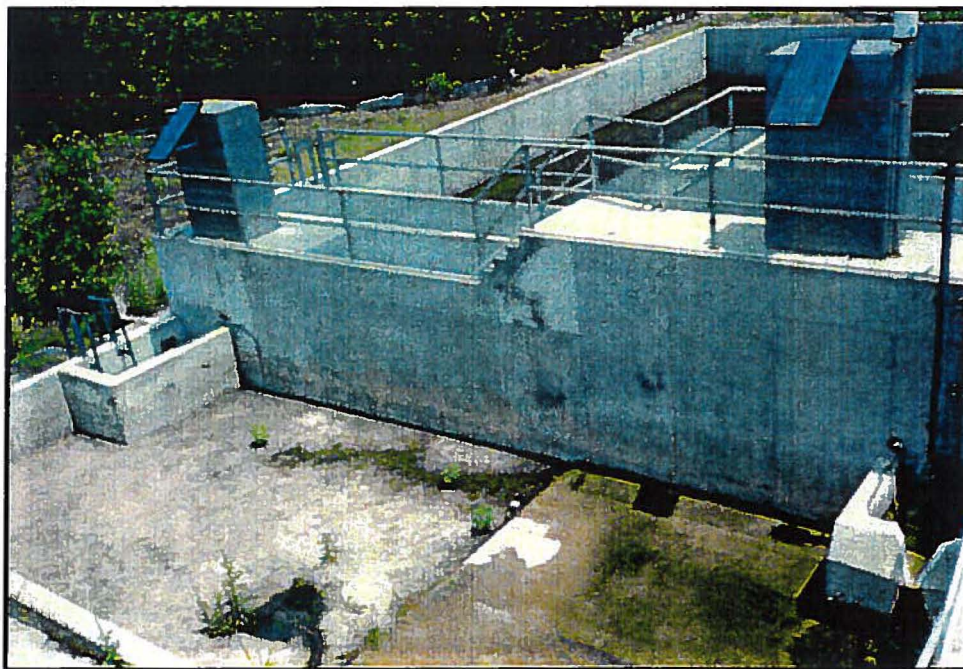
Stormwater monitoring station at Barton Ridge Plaza, viewed from filtration side.
